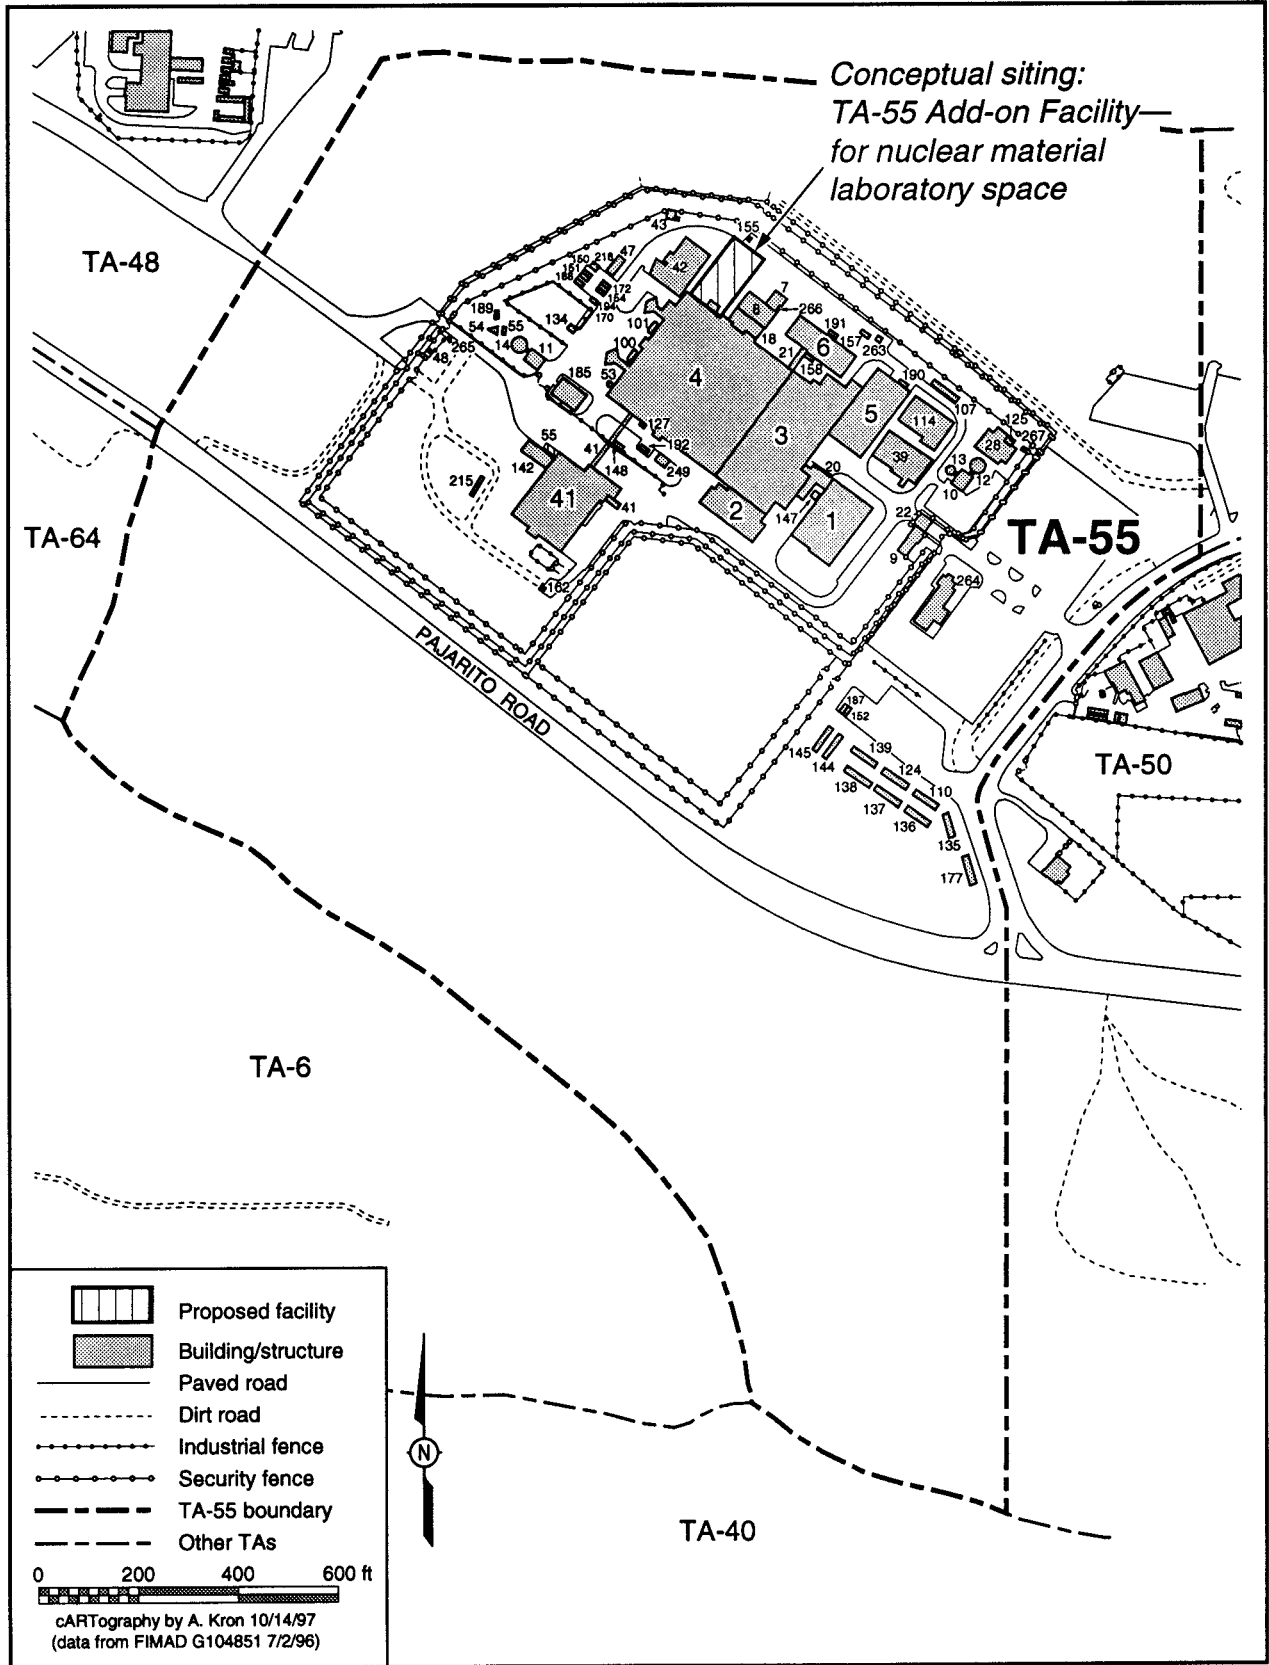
Conceptual Location for the Add-On Facility.
